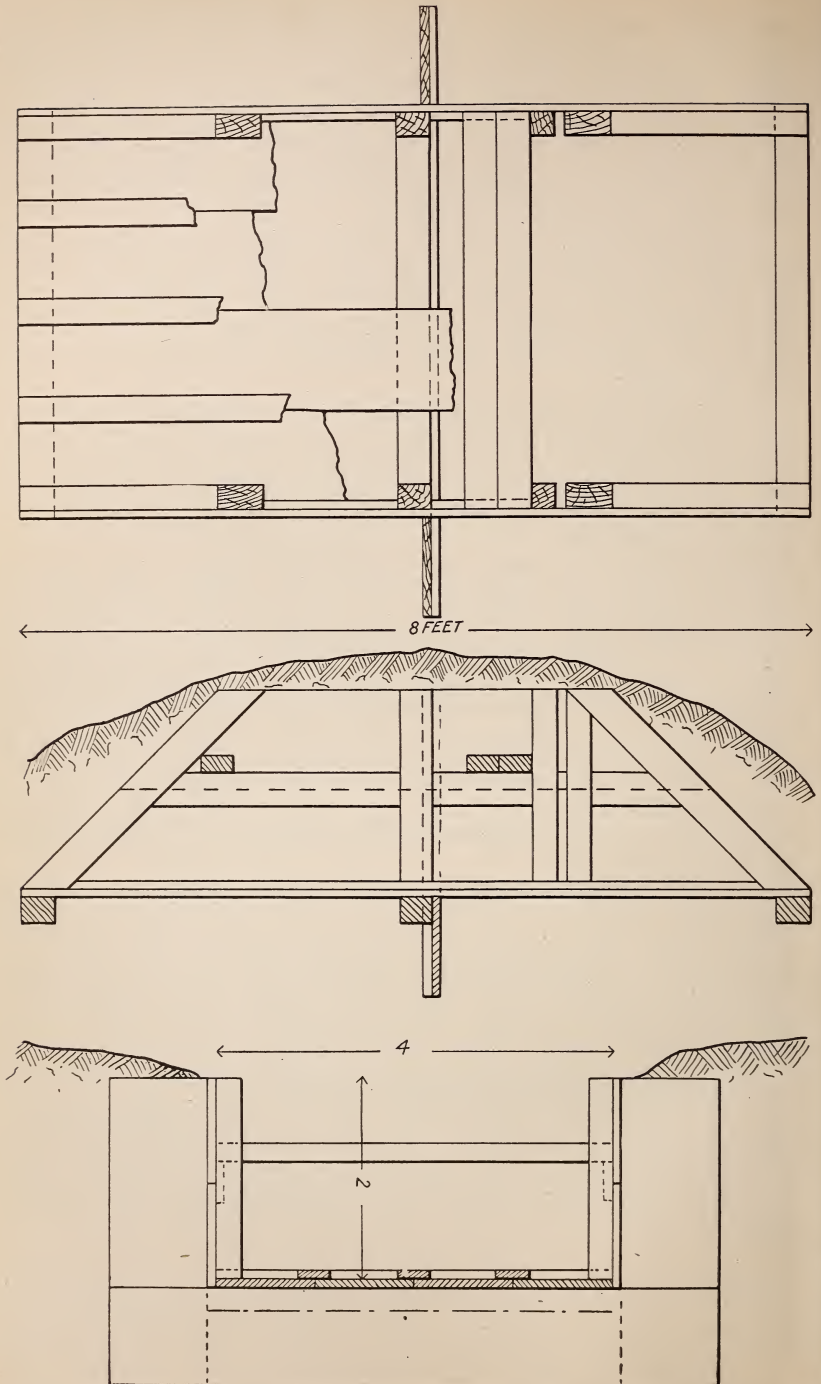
Check box. Section across length at bottom of page, section across side in middle, and longitudinal section showing floor at top.
